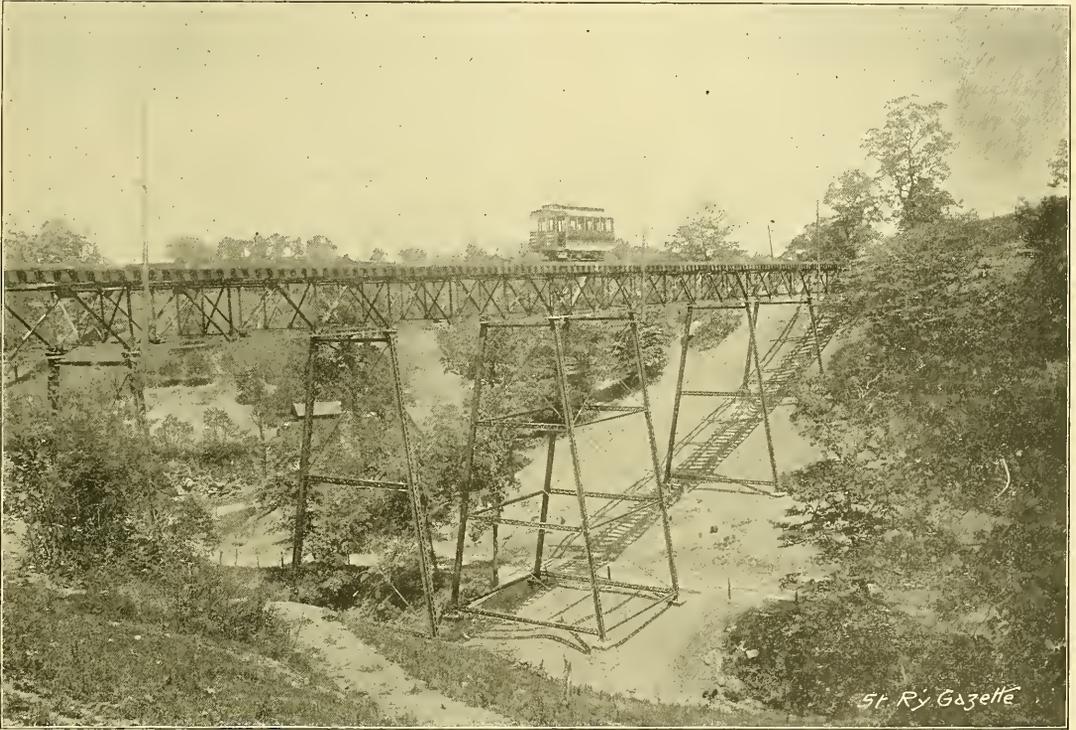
STEEL BRIDGE OVER FOUR MILE RUN.
